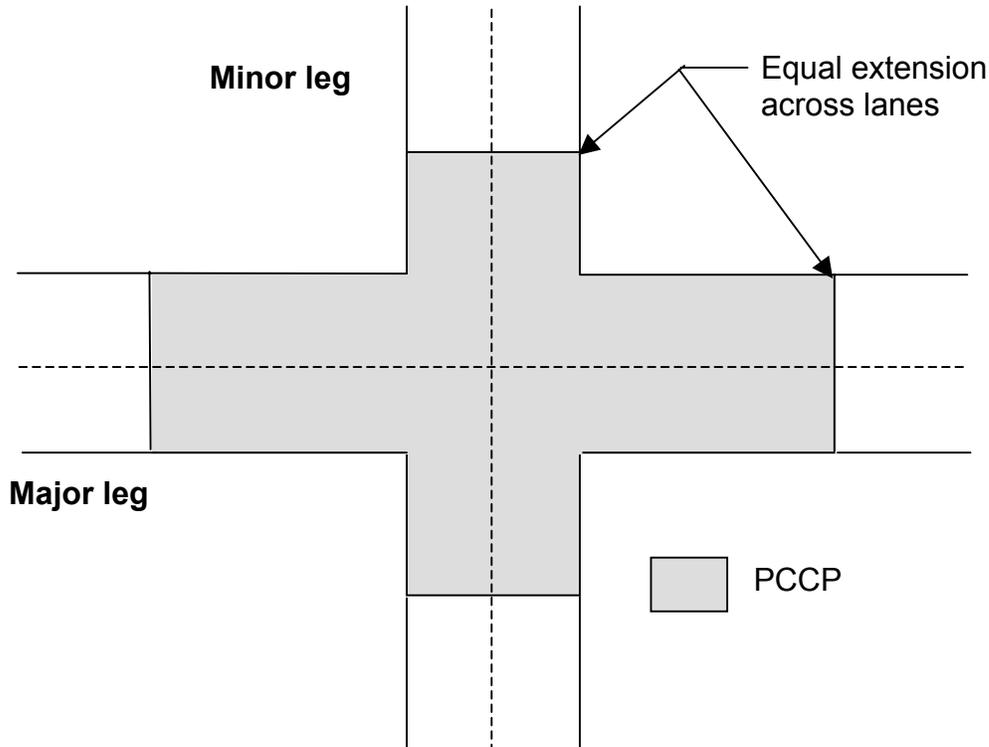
Equal extension of concrete across the leave and approach legs of a PCCP intersection.
